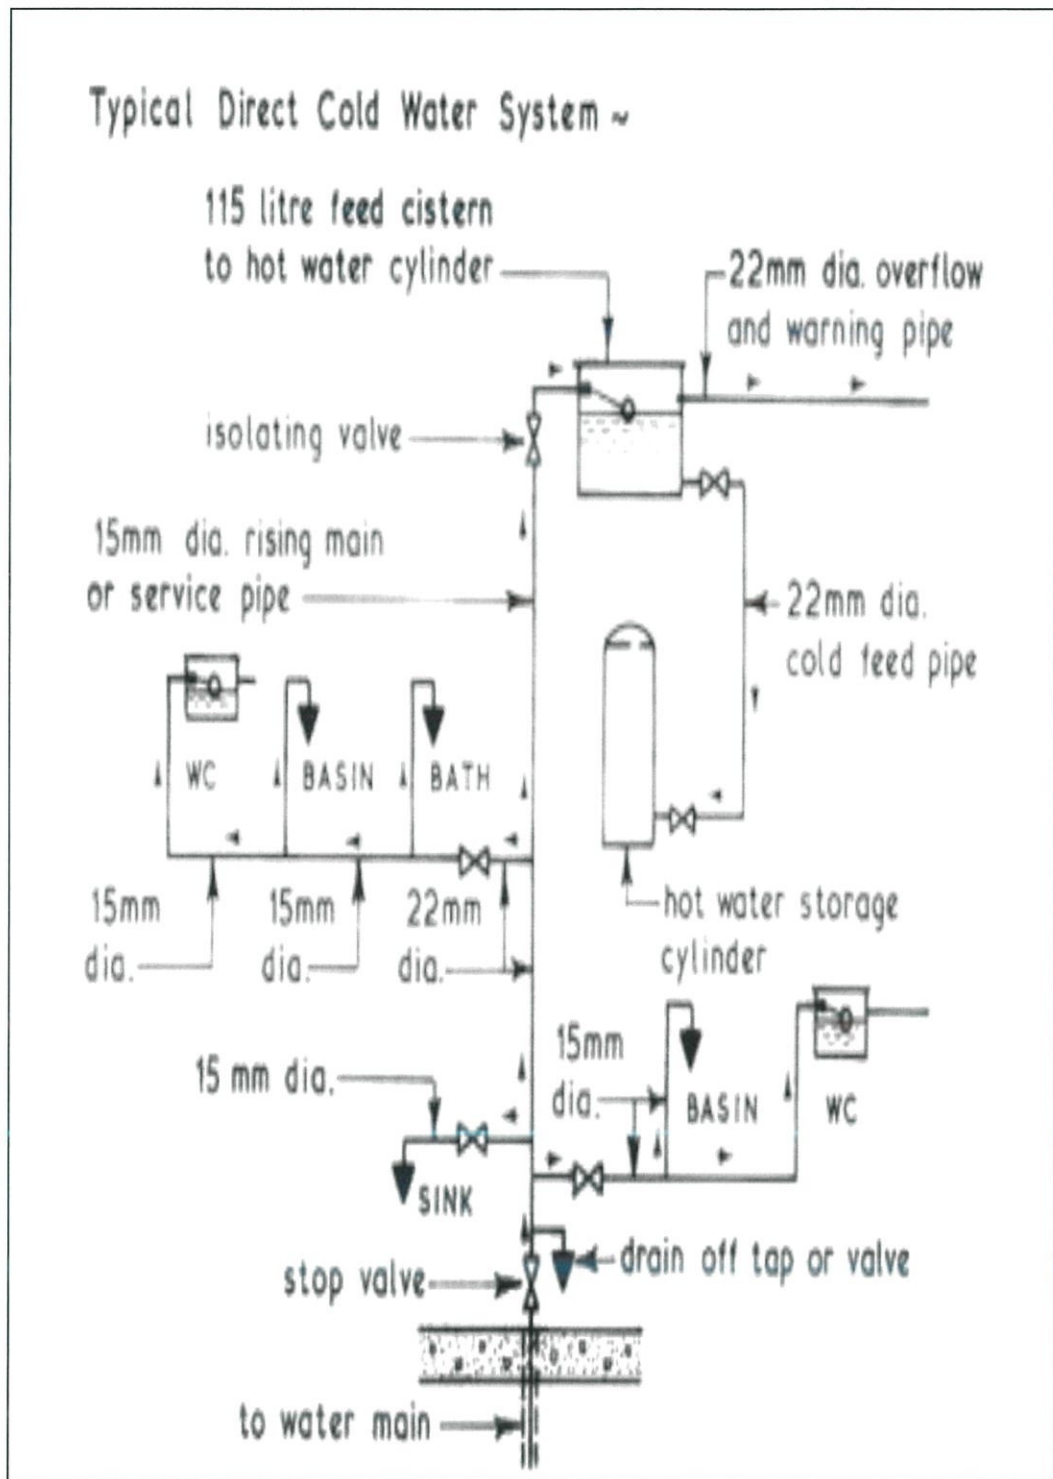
Direct System (source: Greeno, R. (2009). Building Services Handbook: Incorporating Current Building & Construction Regulations. Burlington: Taylor & Francis. )
